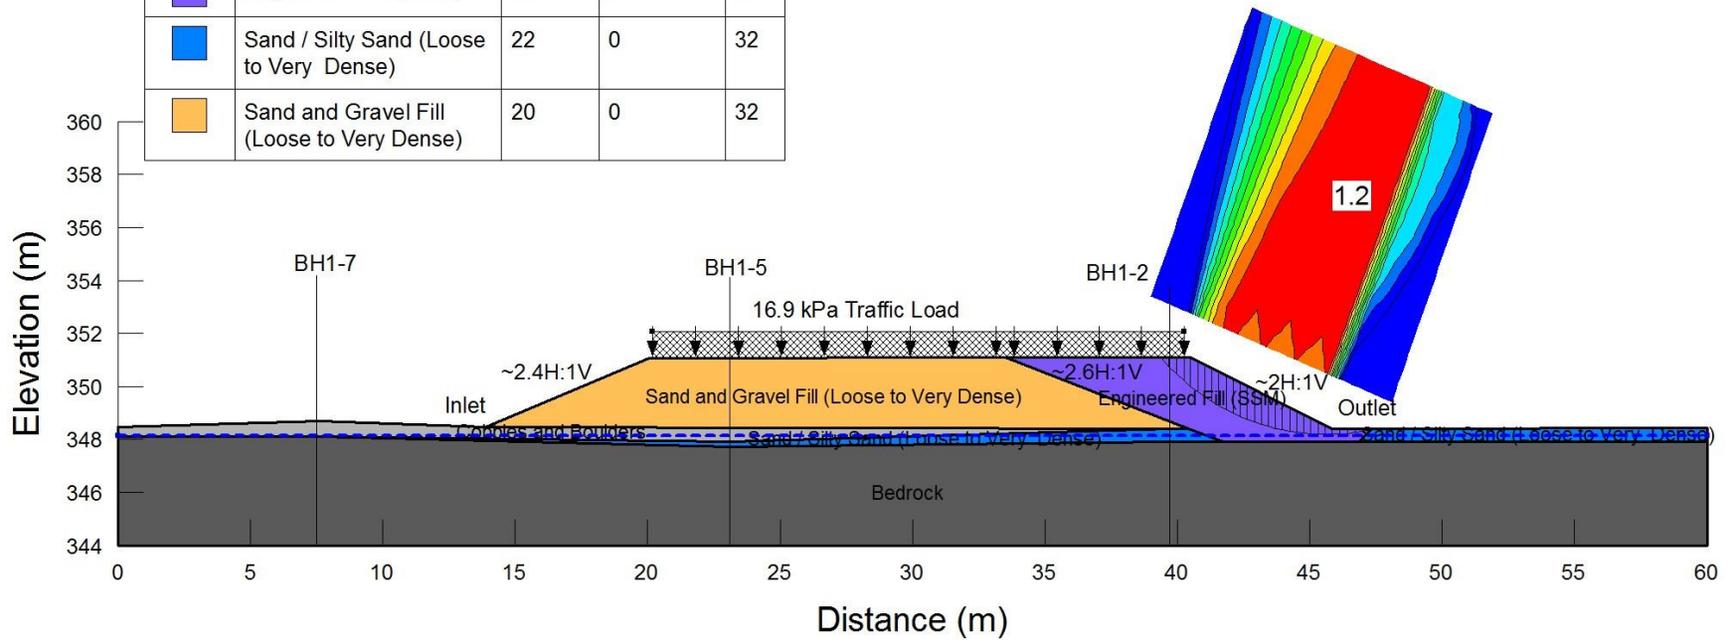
Slope stability analysis for new east (outlet) side of embankment (2H:1V) – drained, seismic condition
